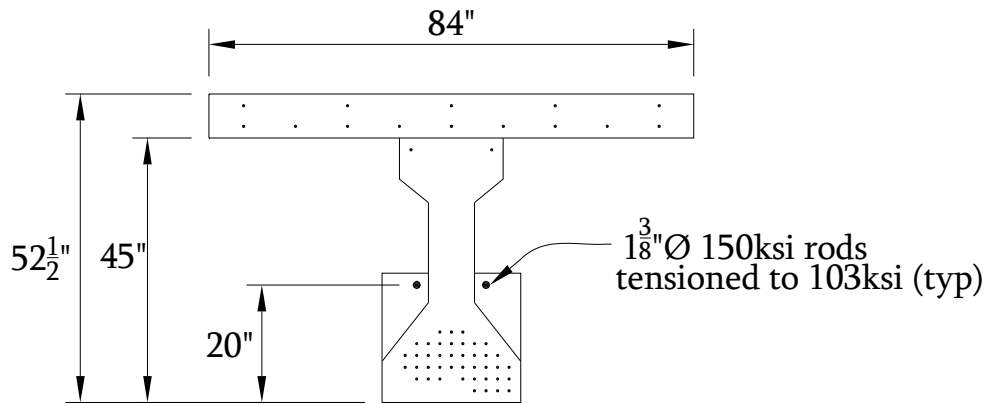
External post-tensioned steel repaired IB 10-2-1 drawing.
